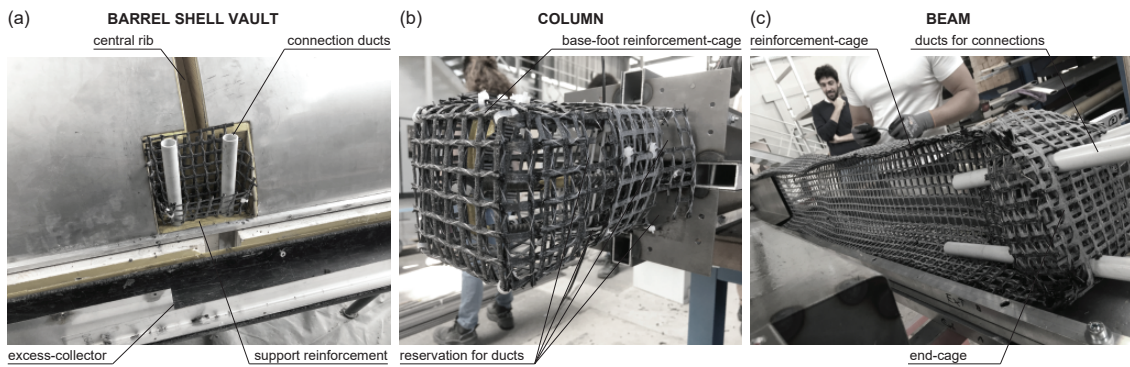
Reinforcement detailing of (a) barrel-shaped shell connection; (b) column-head, and (c) beam.
